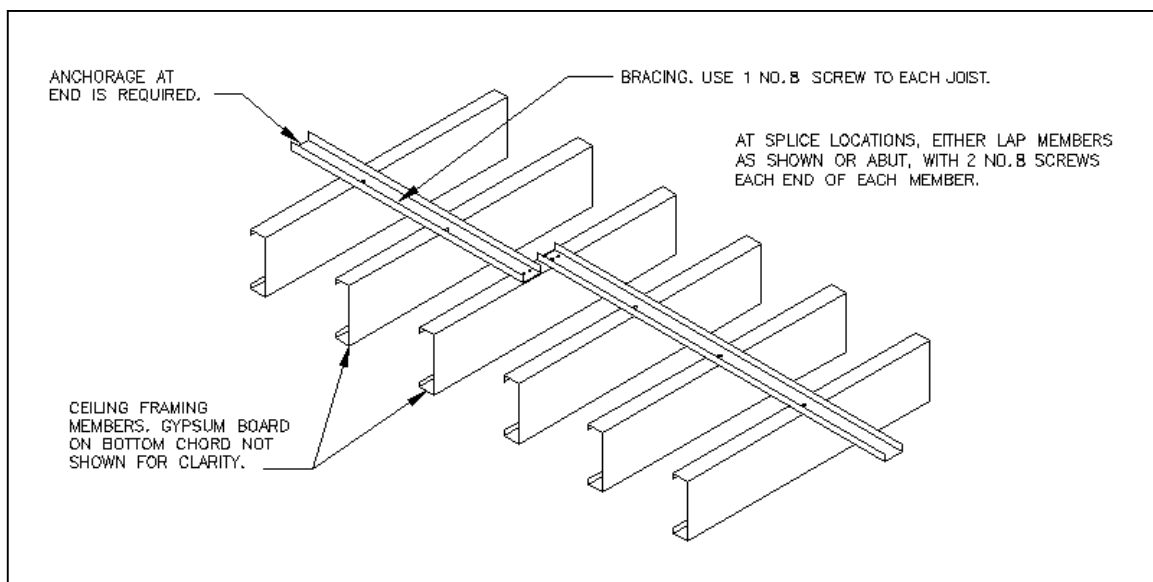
Ceiling Joist Top Flange Bracing with C-Shape, Track or Cold-Rolled Channel Section
